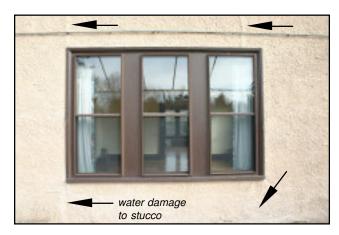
Typical set of windows in main house. Note single pane sash. Also note areas of water damage to stucco.
